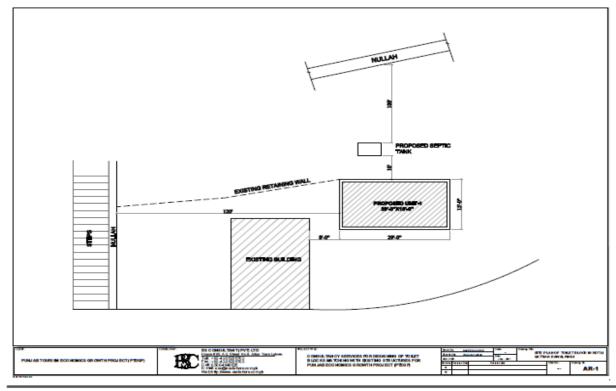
Layout of the proposed toilet block at Danohi rest house, Kotli Satian
